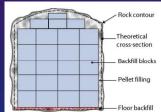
Cross section of a backfilled KBS-3V deposition tunnel showing the three main components of the backfill. 1) precompacted blocks. 2) pellet fill and 3) material placed under the blocks to provide stable foundation for the blocks (Keto et al. 2009a).
